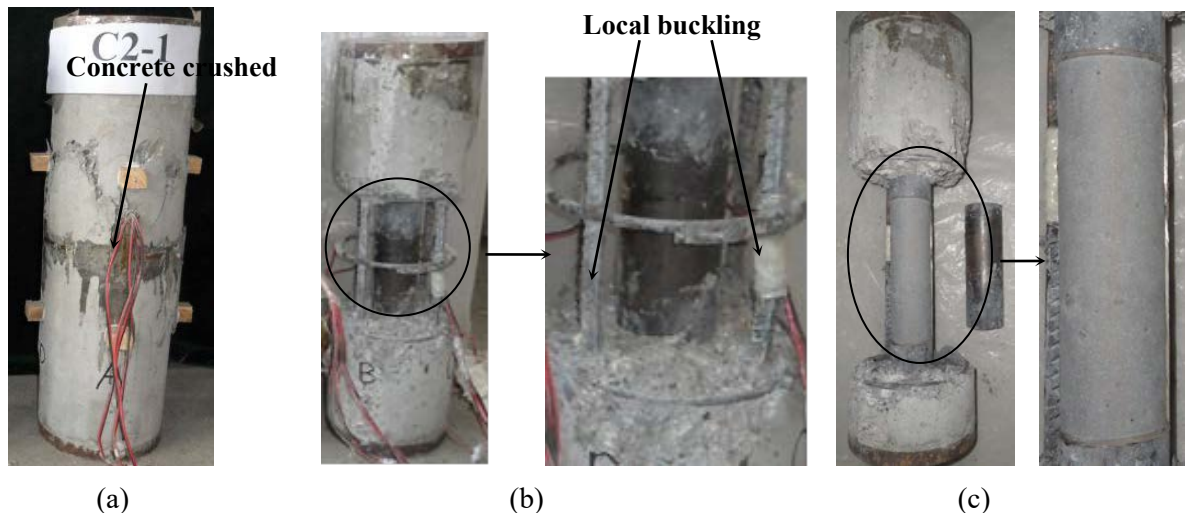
Failure modes of typical concrete-encased CFST stub columns.
